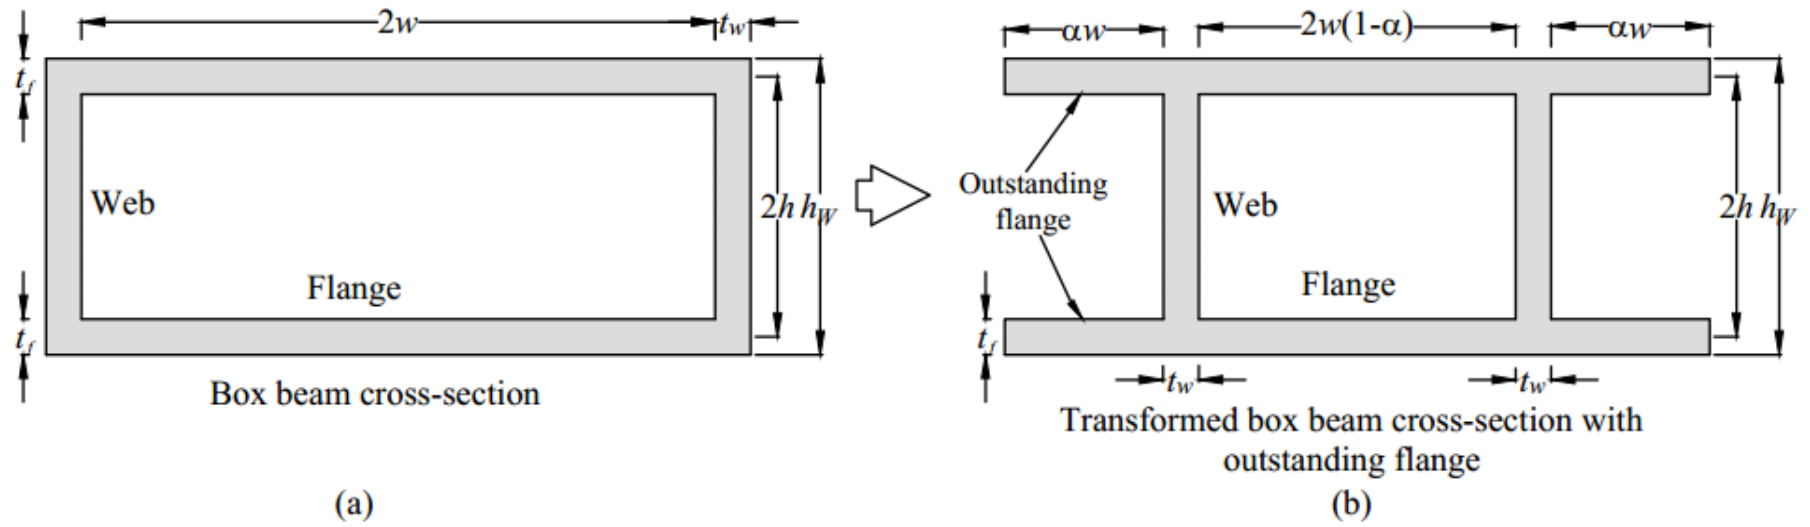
(a) Cross-sections of the box beam, (b) Cross-section of the box beam with outstanding flange
